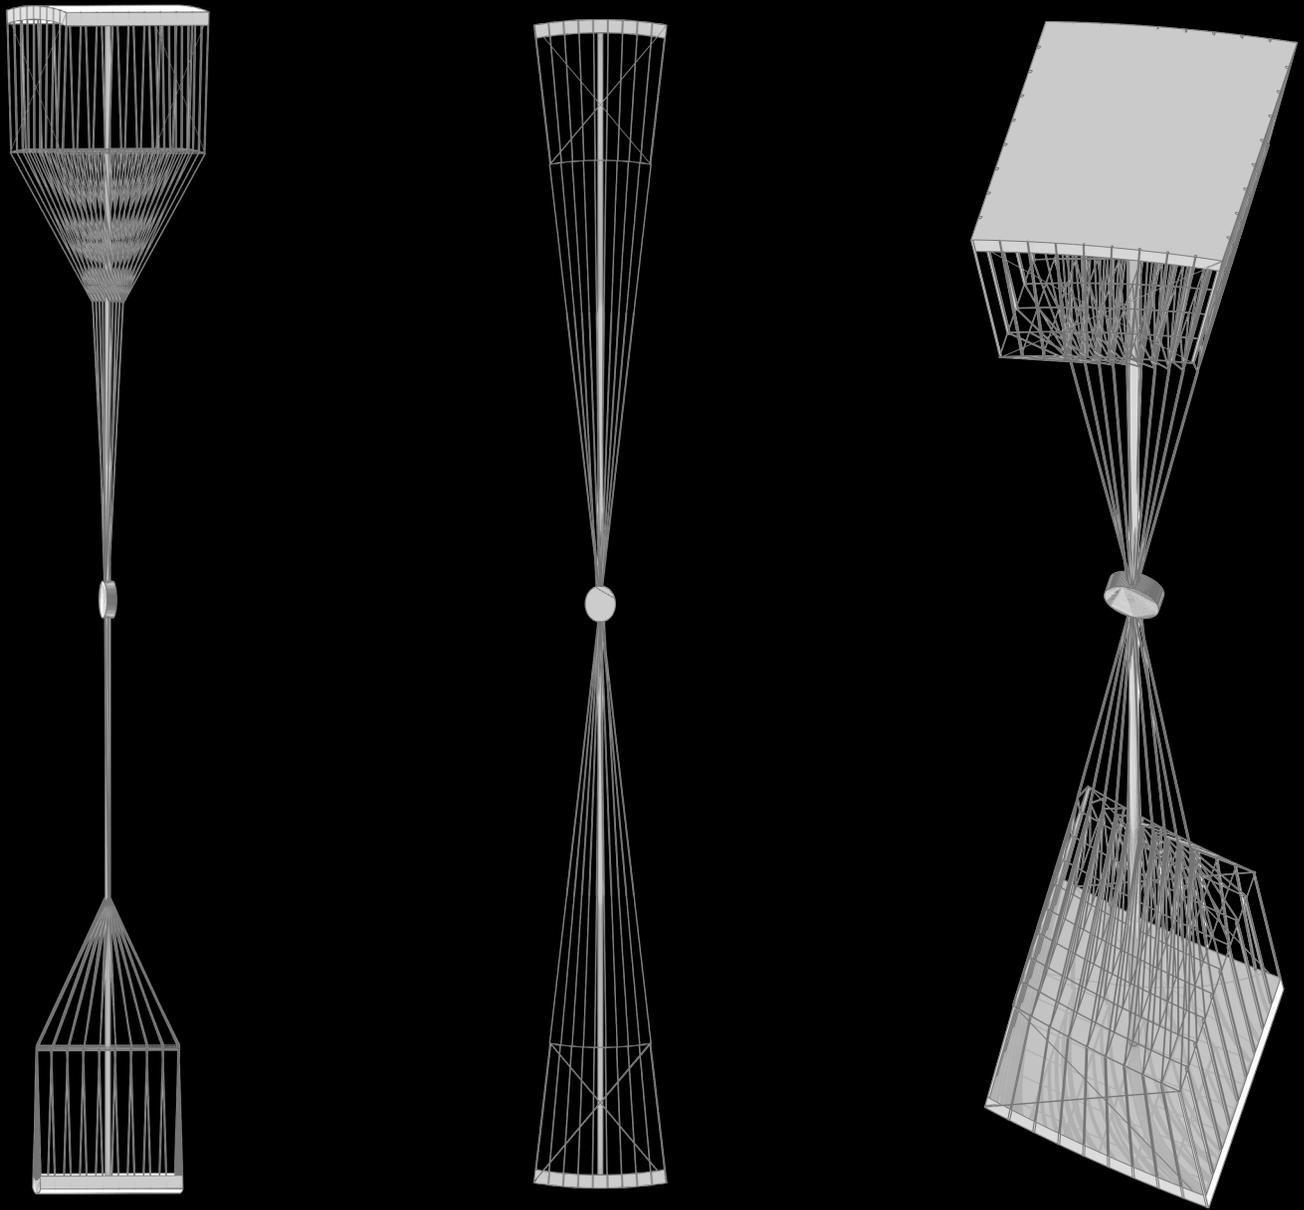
Tensile members act like bike spokes to support the floor of the colony. Tensile Members also support a two way beam that line the ceiling of the colony. High density housing blocks are supported on the tension ring. Buildings appear to float.
